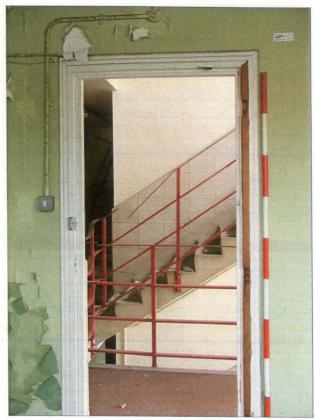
Detail Art Deco architrave, first floor office (Scale = 2m)
